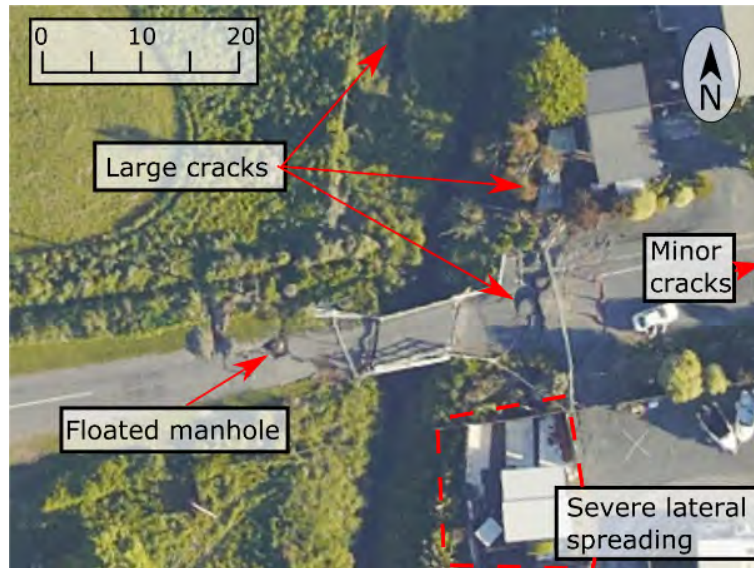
Site layout and features of interest at Lyell Creek Bridge [-42.3892, 173.6773].
